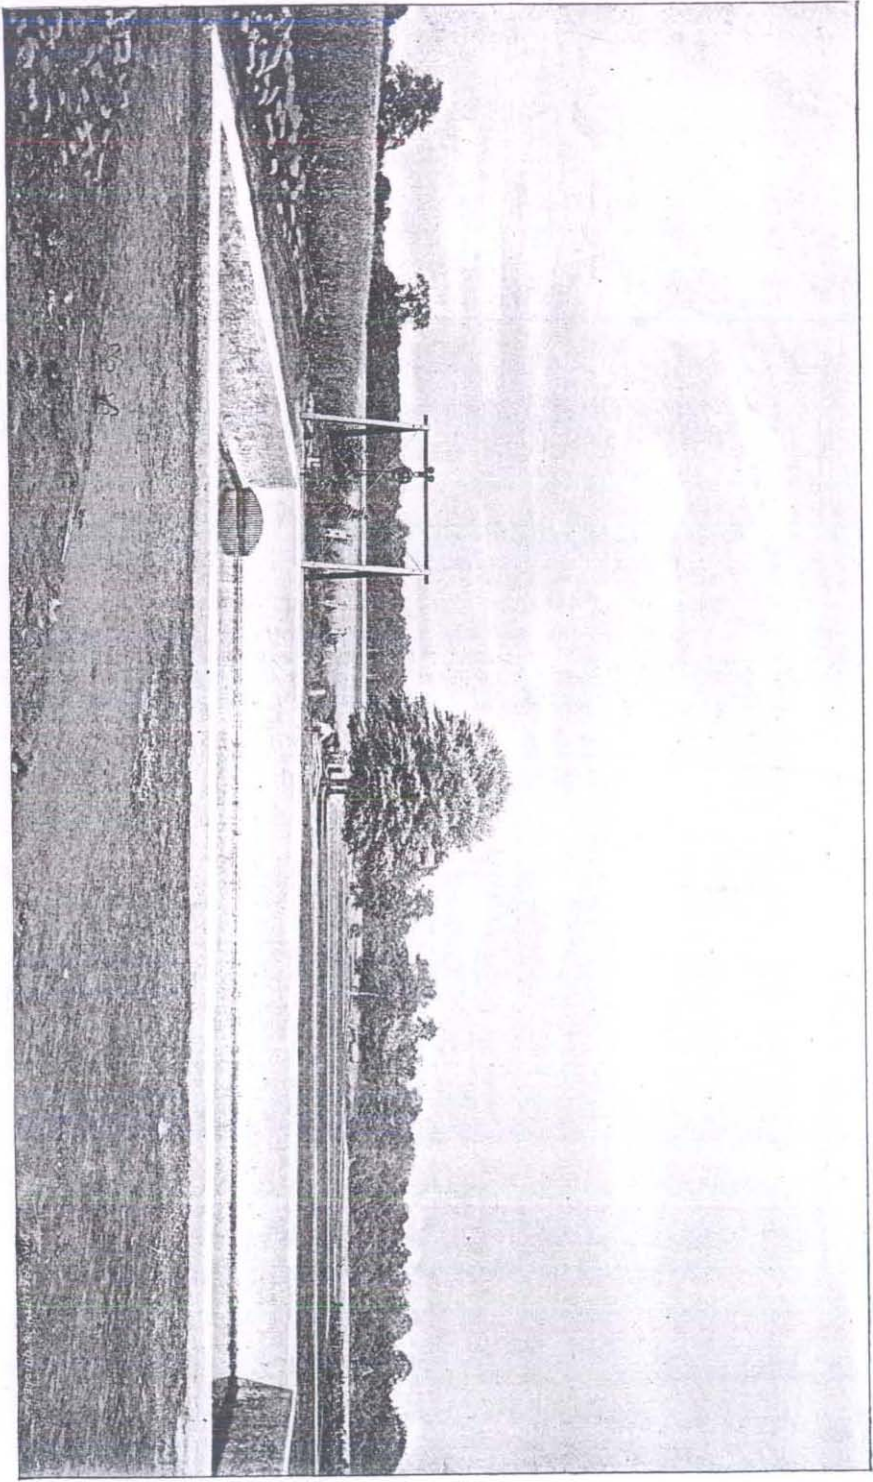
The Sewage Tank, with Disposal Ground beyond.
